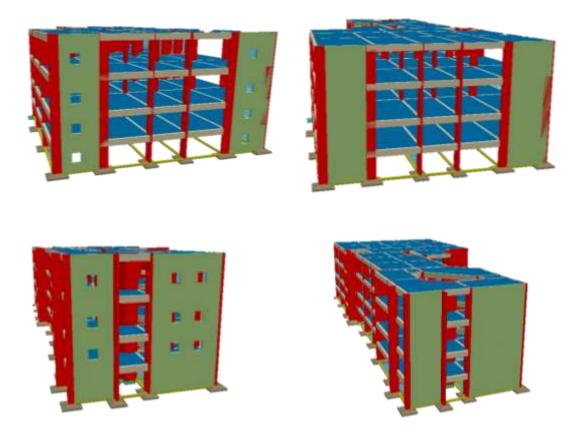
(a) Shear walls with openings (b) shear walls with no openings
